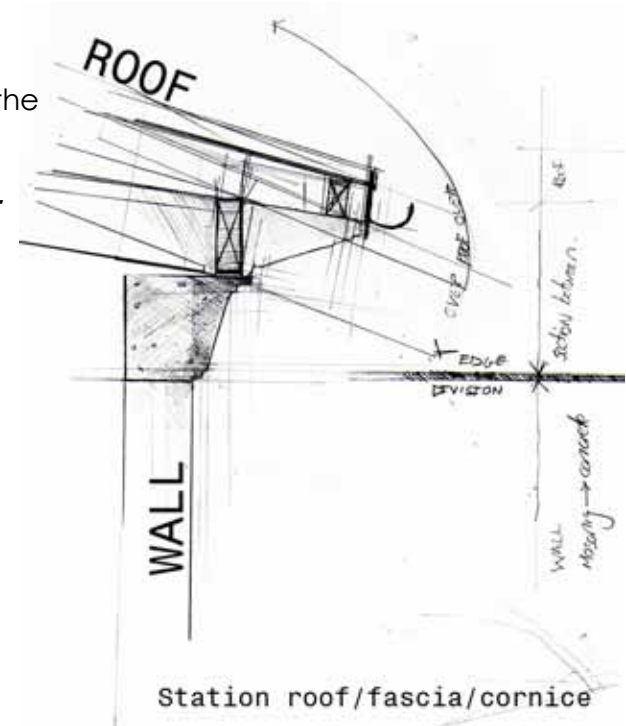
Detail development: Referring to the station roof [Source: Author]
